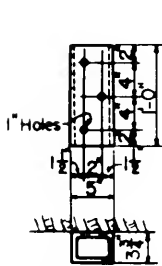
D - SOLID CONCRETE FLOOR DETAILS
